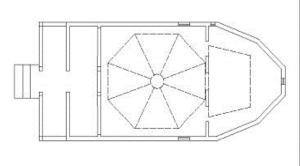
The architectural plan of Lunca Priporului church Fig.9. The measurements made in situ.
